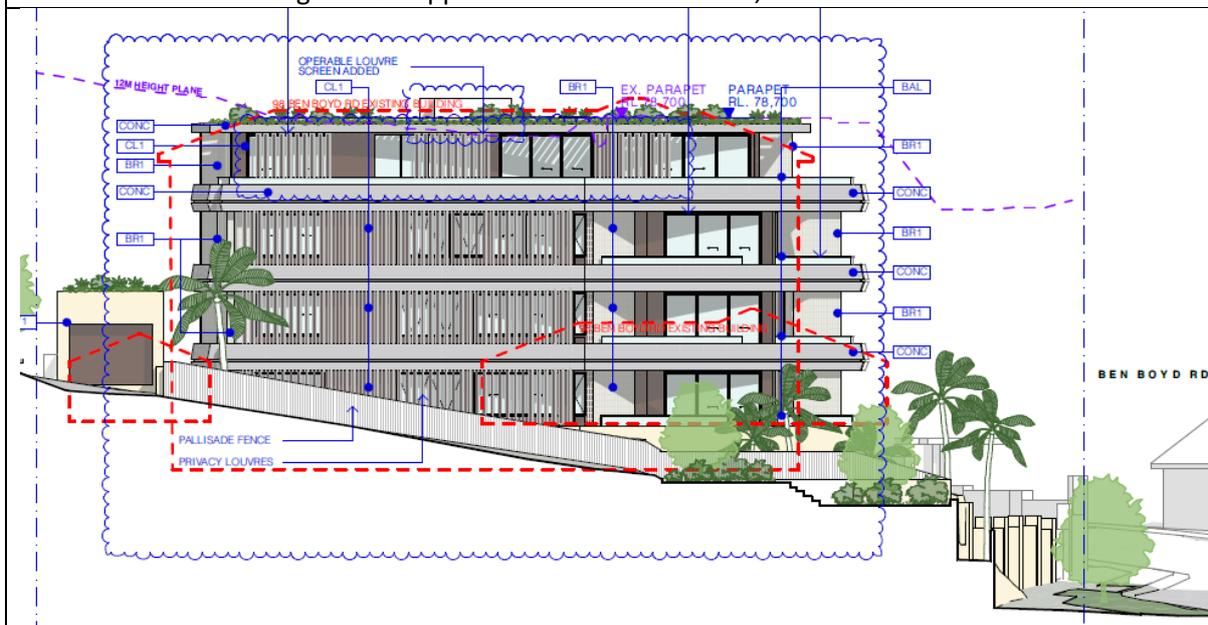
Proposed Western Elevation, DA 3003 Rev F
